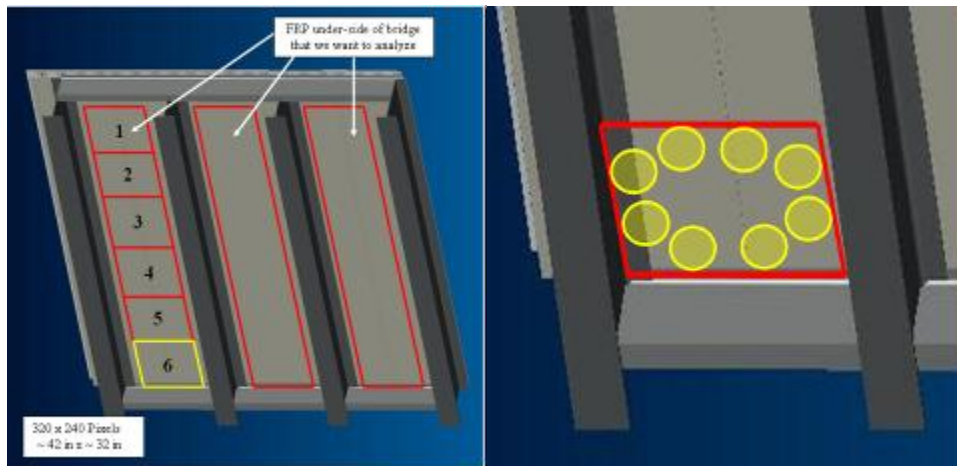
Conceptual design for IRT inspection of GFRP bridge decks for steel stringer bridge.
